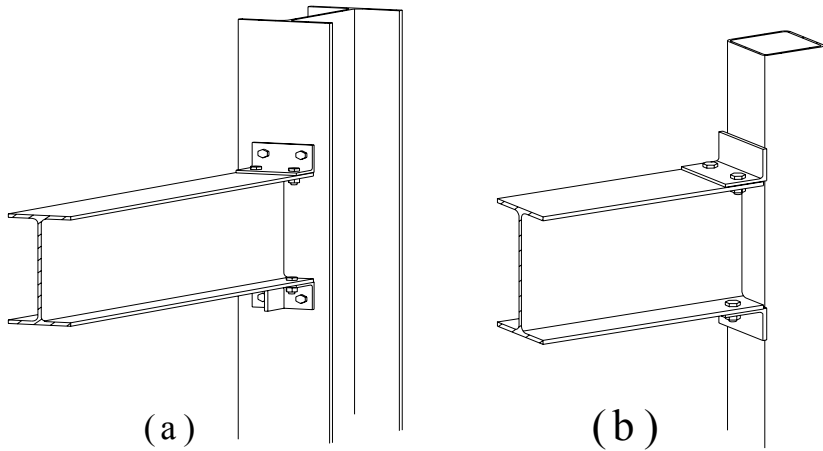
Seat Angle Connection and Built-up Tee-stub Connection
